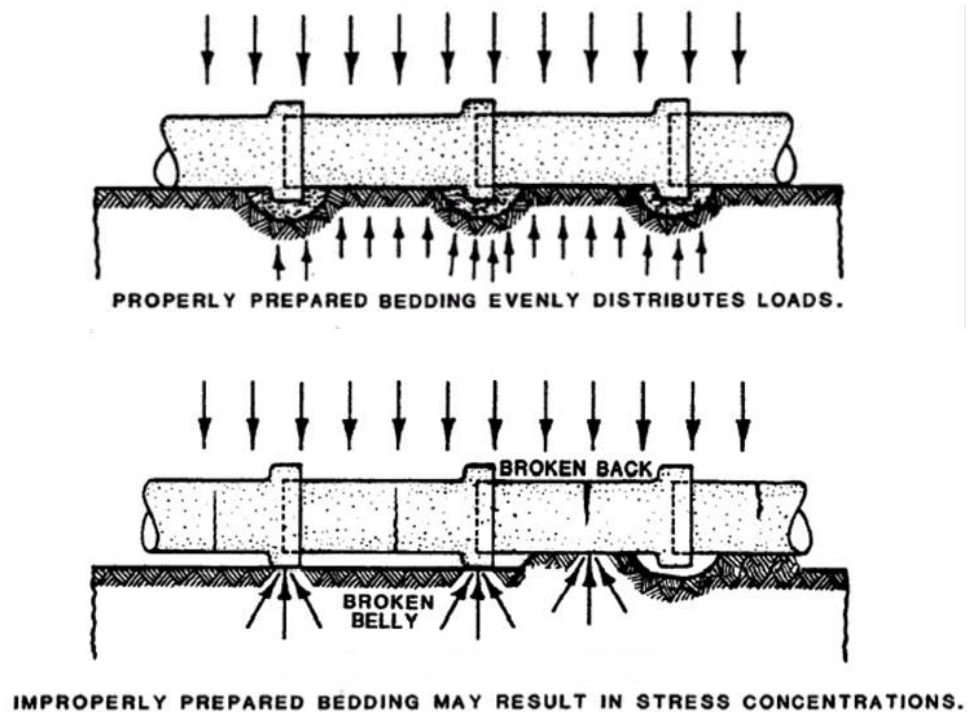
Transverse Cracks in Pipe Culvert
